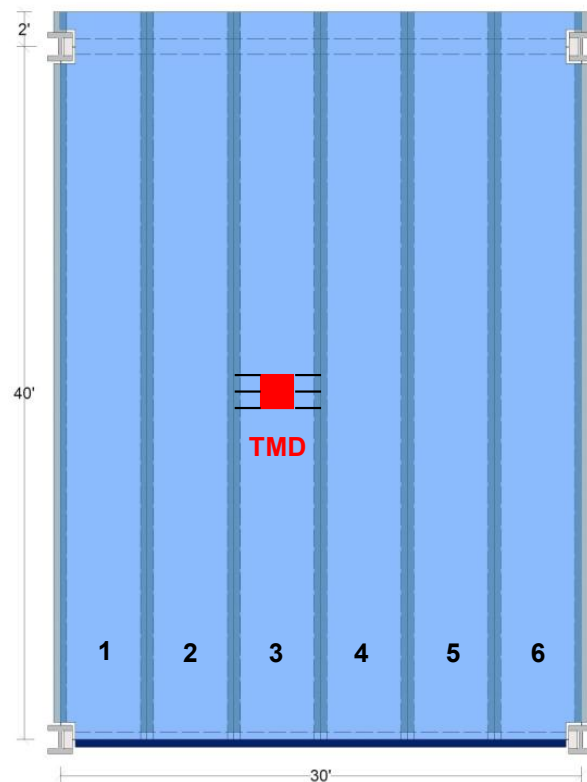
Plan Layout of the FastFloor Specimen with the TMD Installed at the Center of Module 3
